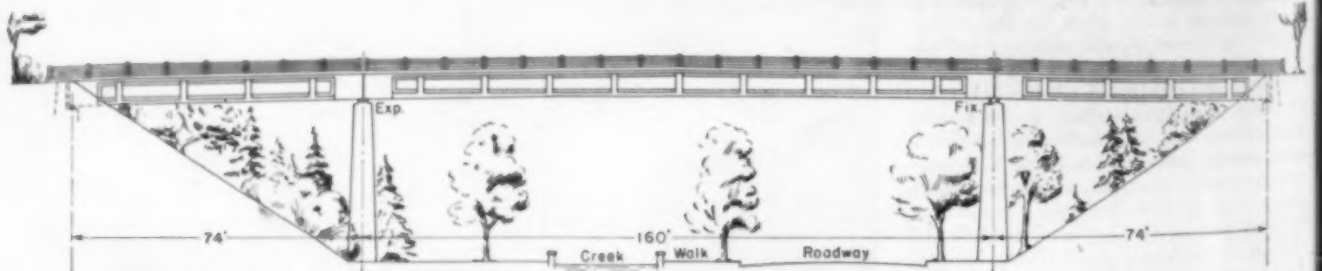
WALNUT LANE BRIDGE, under construction in Philadelphia, incorporates long-span prestressed concrete girders thus introducing design new to United States.
